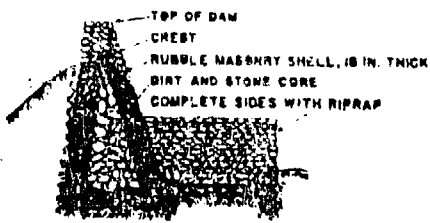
CONSTRUCTION OF DAMS, FLUMES, AND HEADGATES
